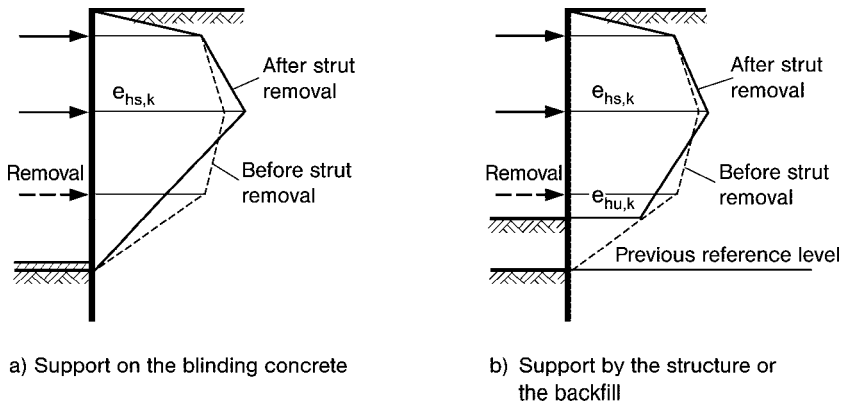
Pressure diagrams for soldier pile walls in retreating states
